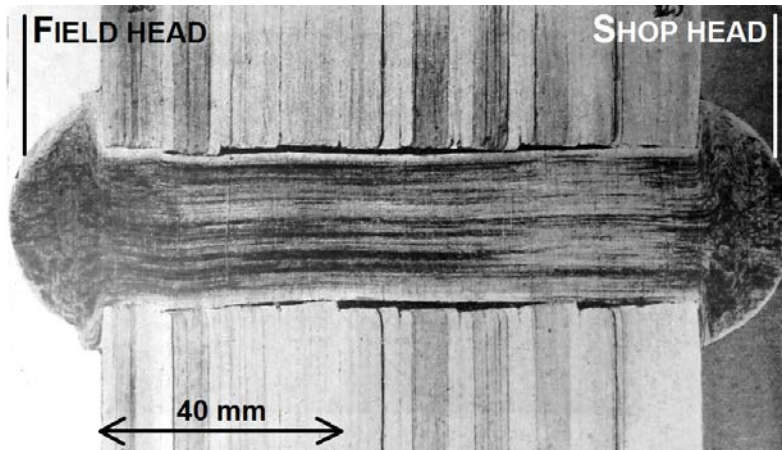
Better upset of the shank near the field head end of rivets having long grips; the rivet was driven with a JF. Allen's pneumatic riveting machine to fabricate a 100-mm-grip wrought-iron riveted connection (Frémont 1906, 60, 67)⁴⁰
